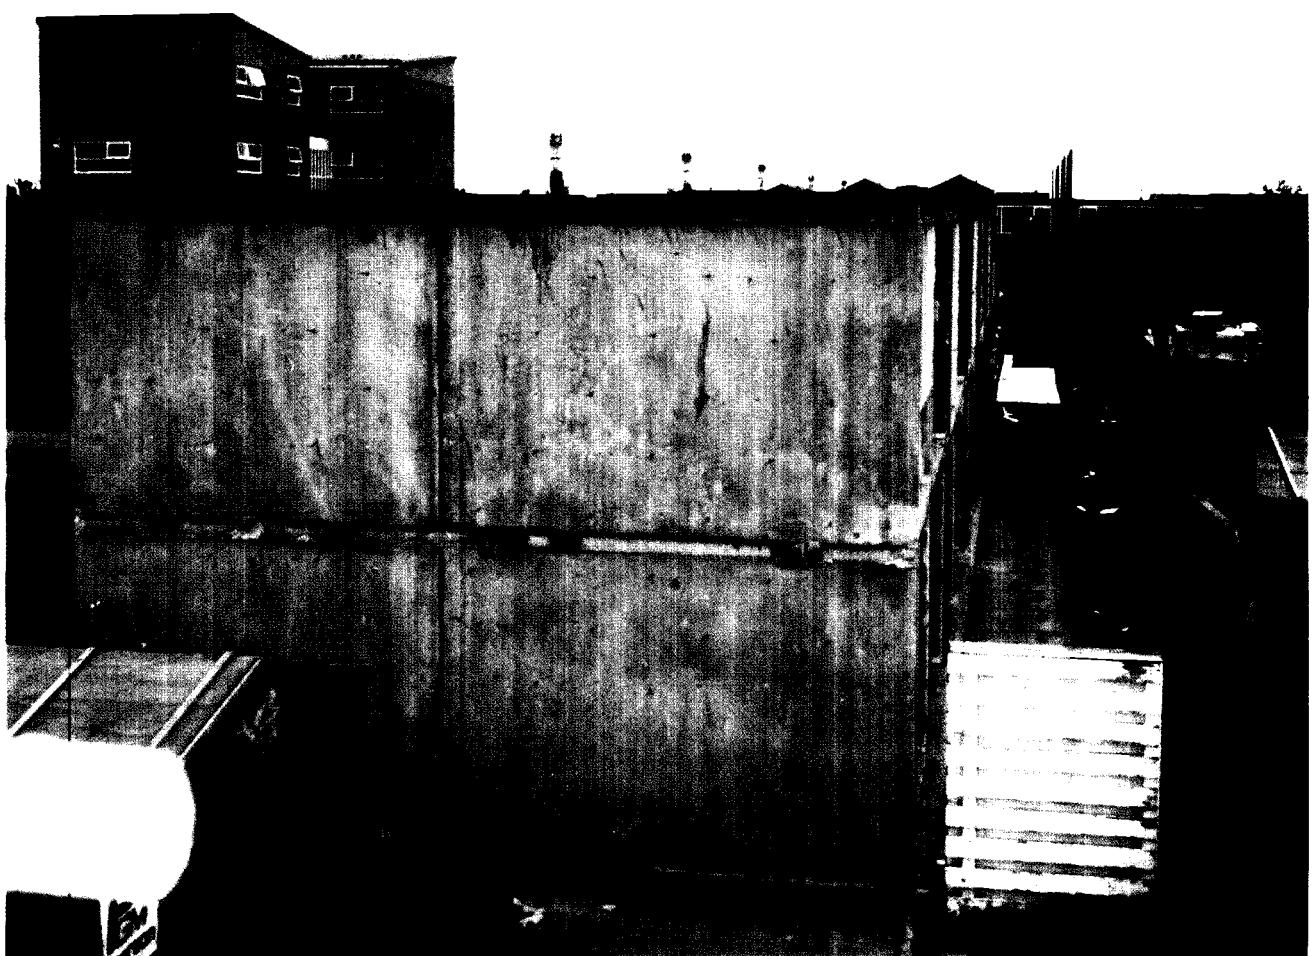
Skarne: removal of brick cladding from flank walls as part of renovation scheme
